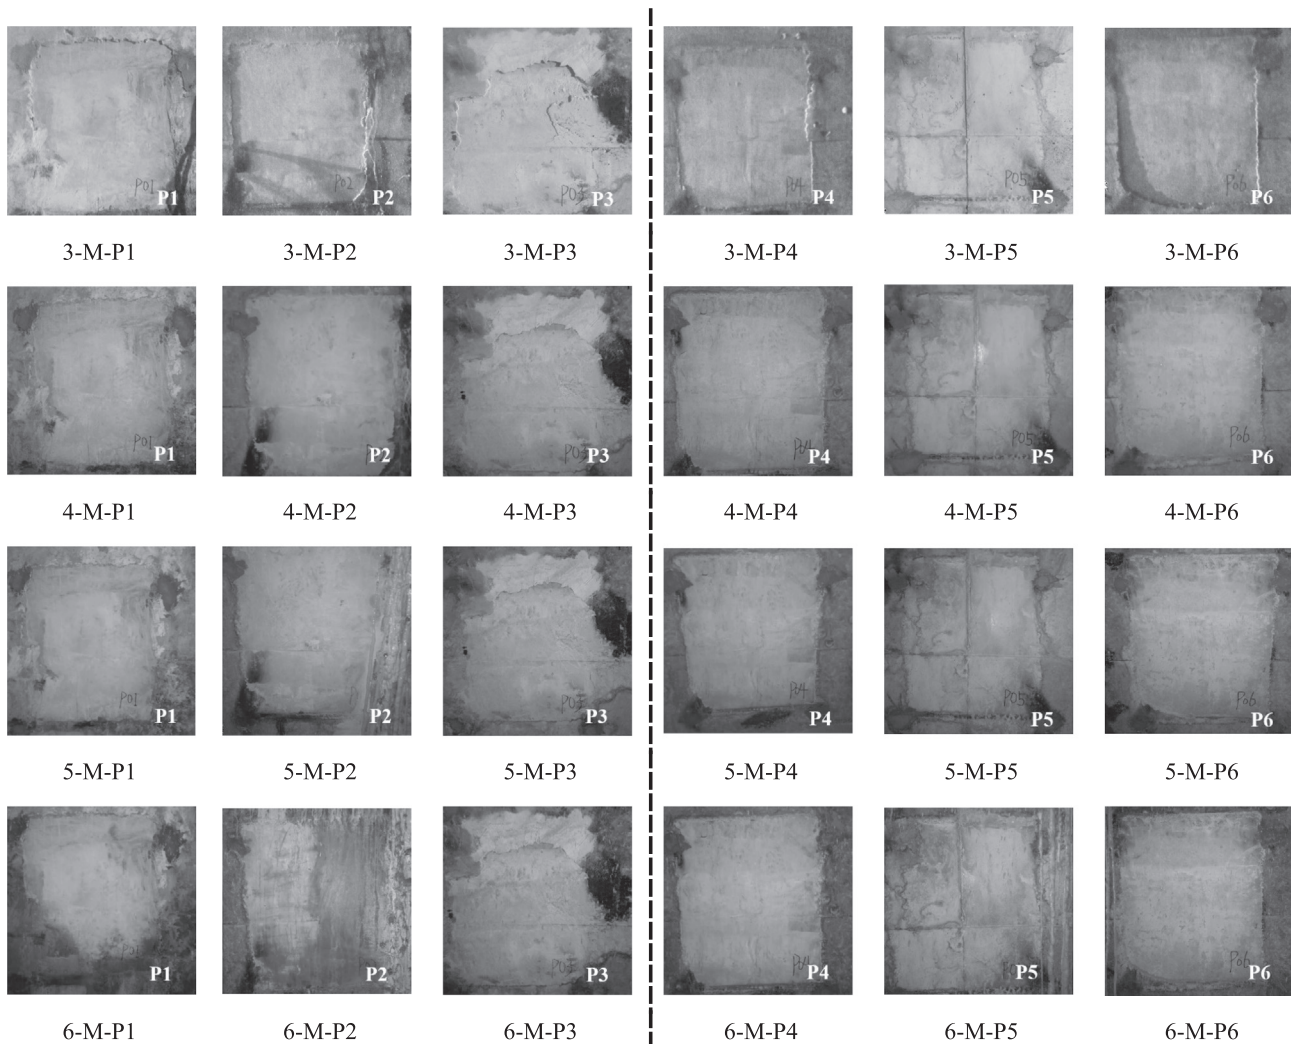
Experimental observations of the precast concrete slabs embedded in the structure. (M: month).
